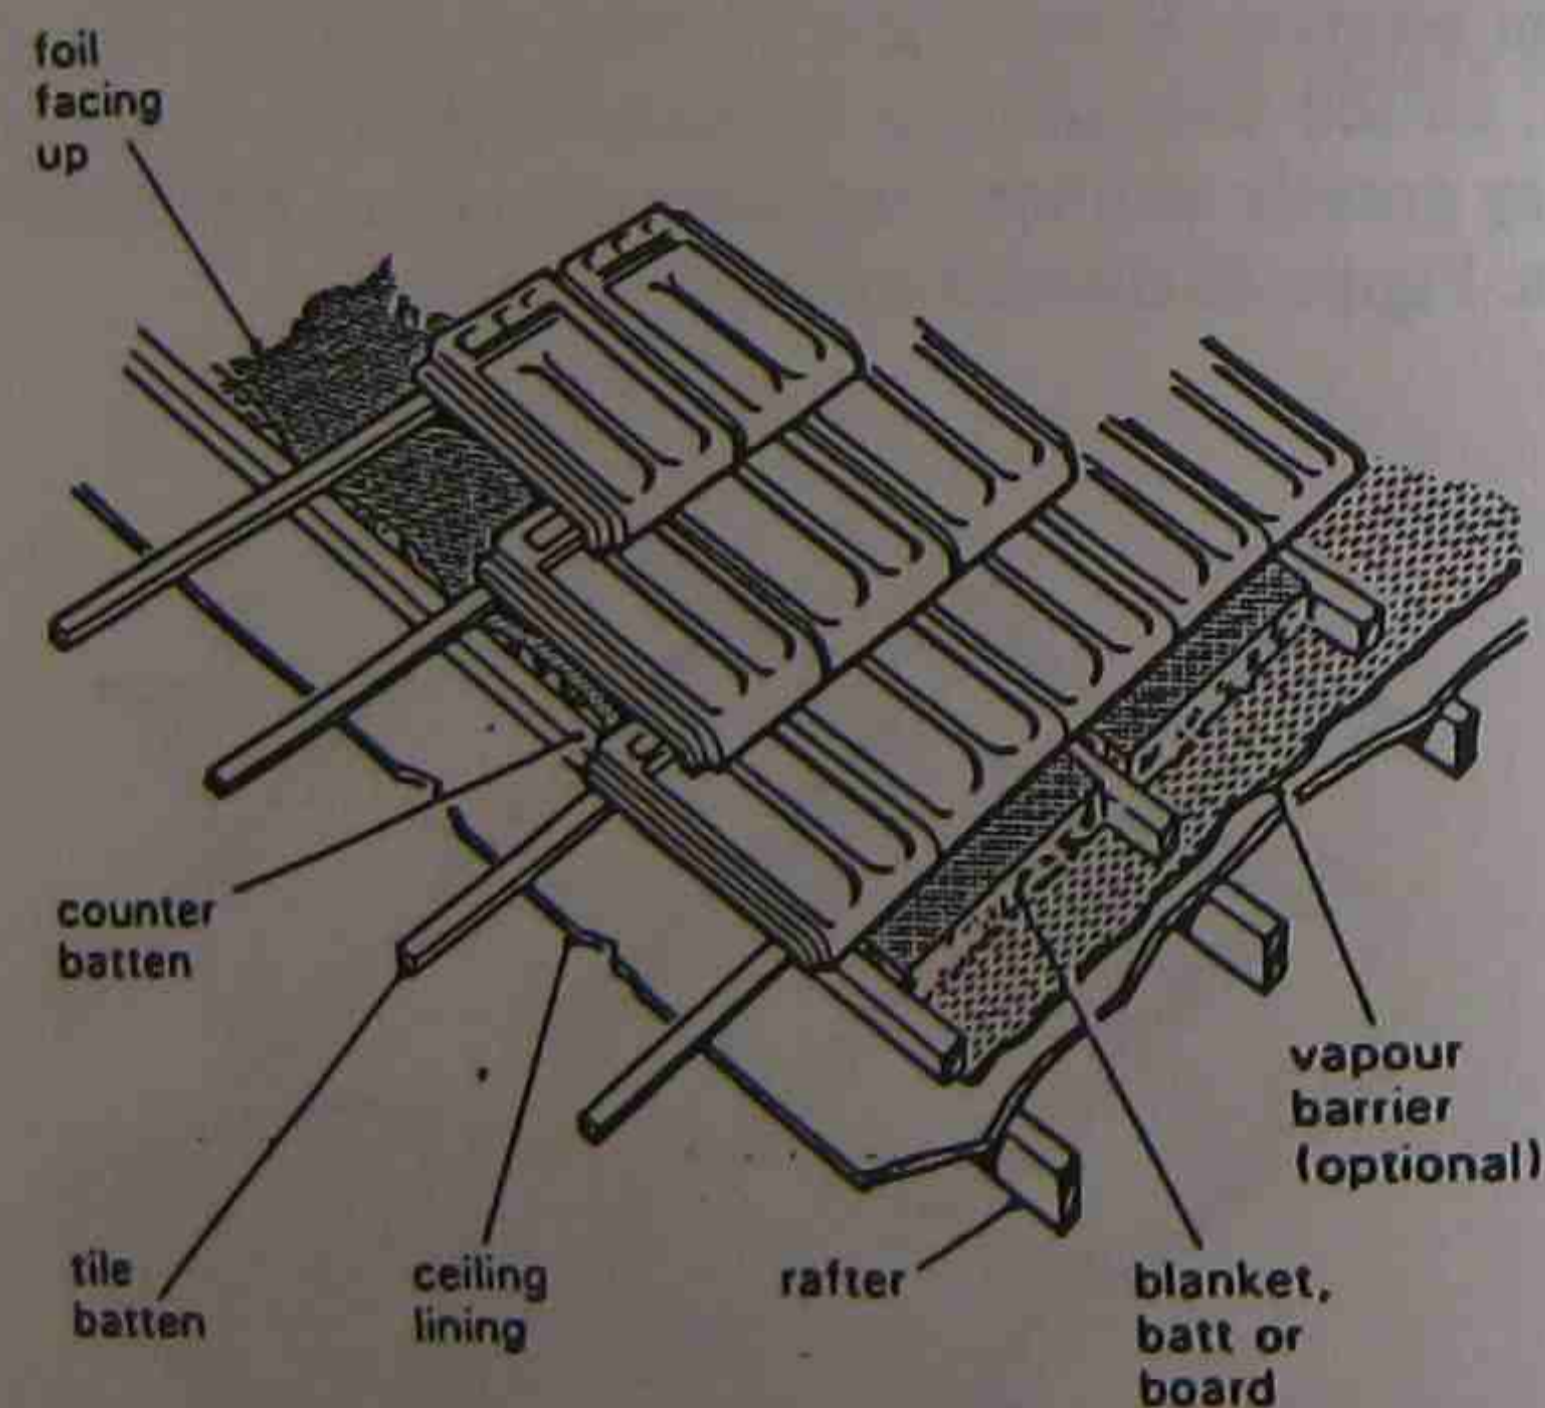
Bulk insulation and reflective foil used under a tiled roof where rafters are exposed.
